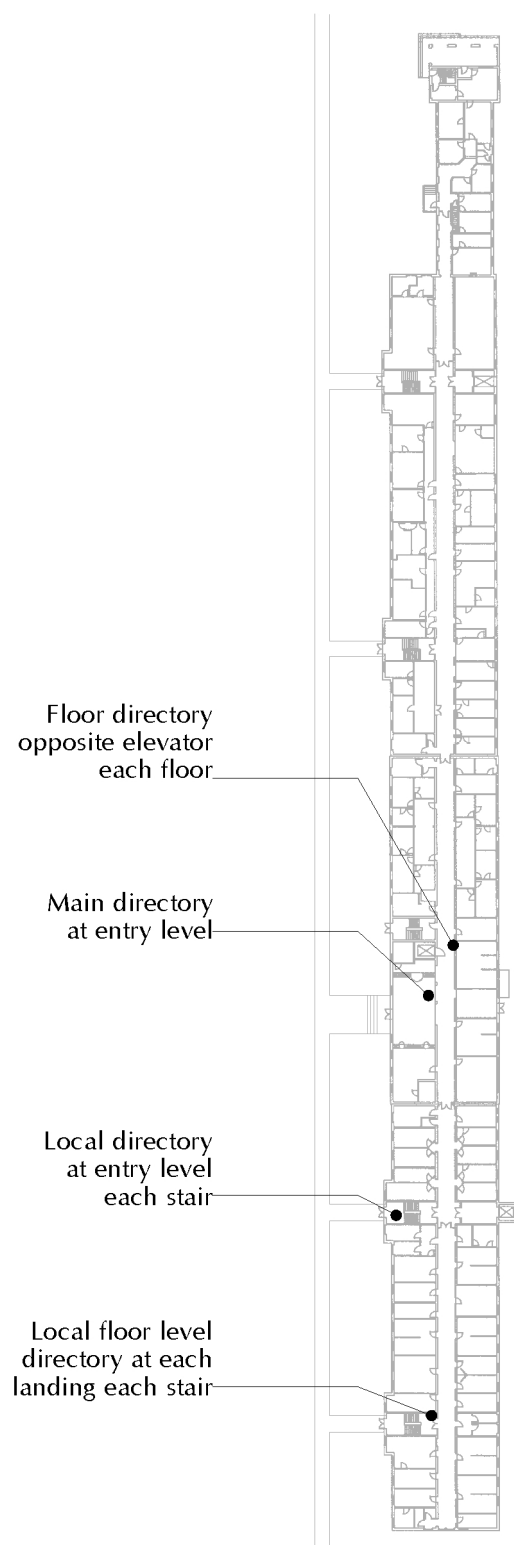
Heidelberg Hospital, Entry Floor Plan of Building 3611; showing typical location of primary signage elements.
